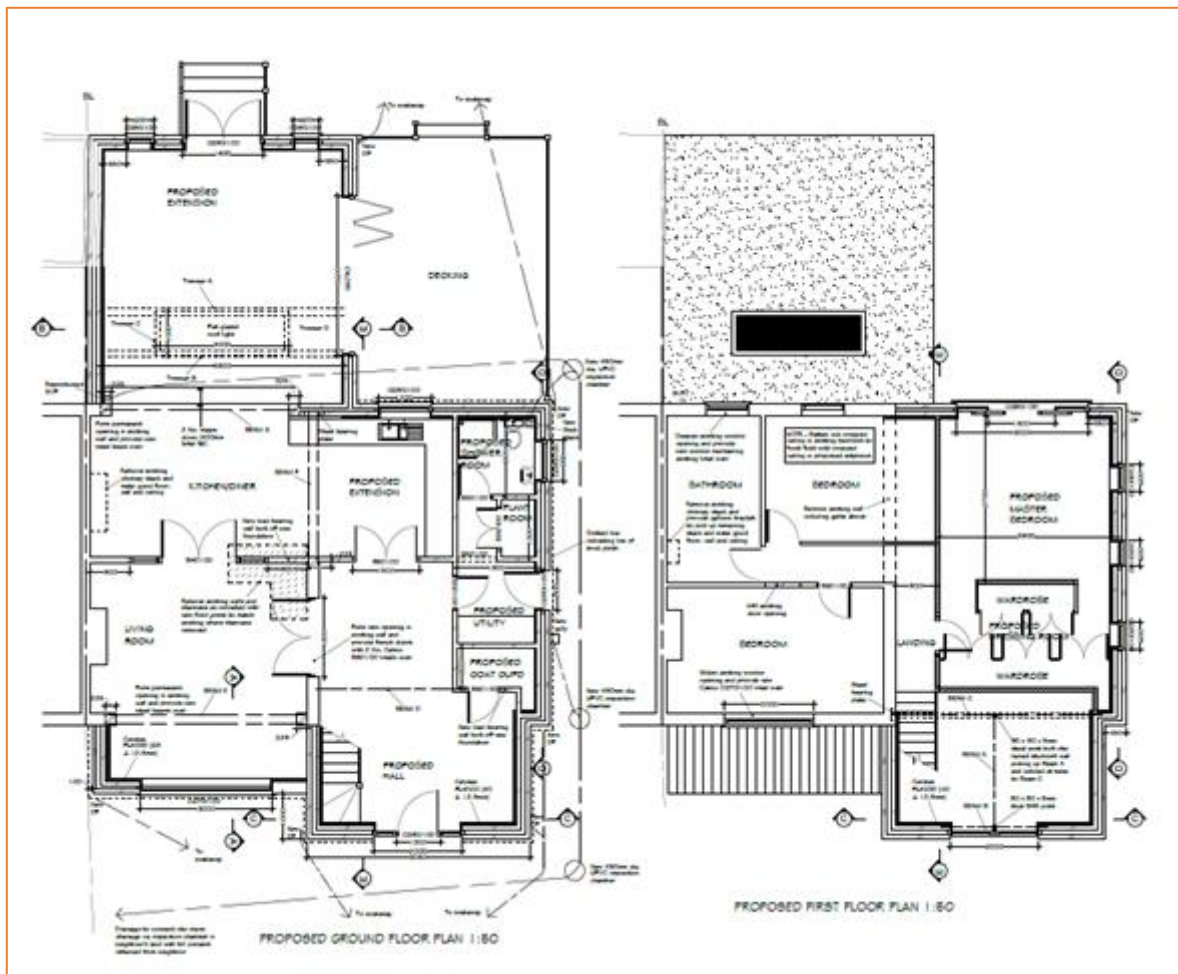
Proposed ground and first floor plan (Source: ABDS)
